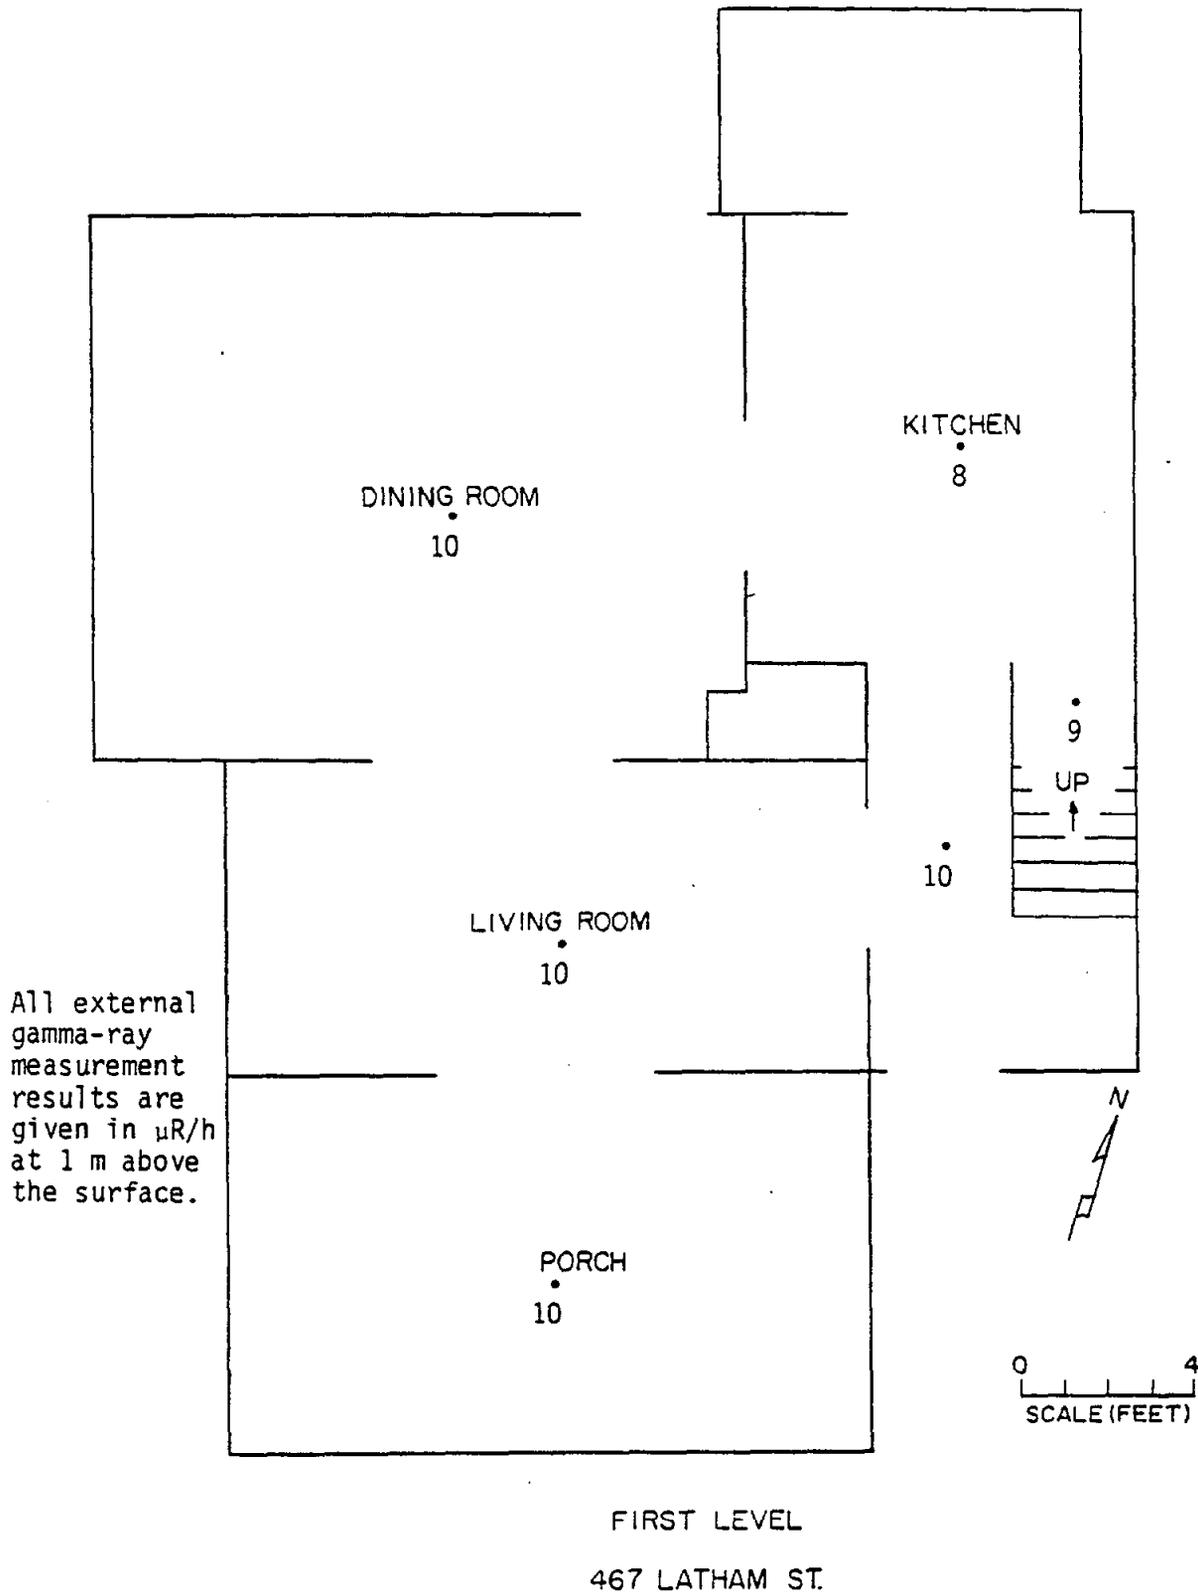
Schematic of the first level floor plan at 467 Latham Street showing external gamma-ray measurement results at 1 m.
